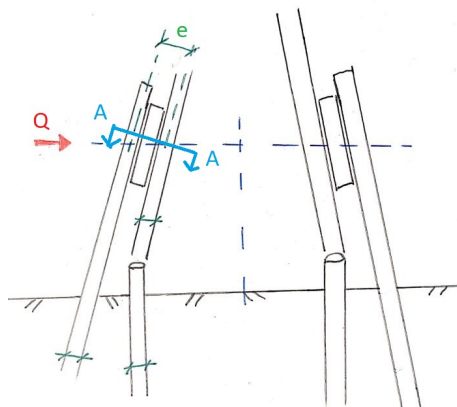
The figure shows a sketch of the rehabilitation situation with a horizontal wind load Q . The eccentricity e between the supporting pile and the original column is marked in the sketch. A cross-section A-A is marked in blue.
